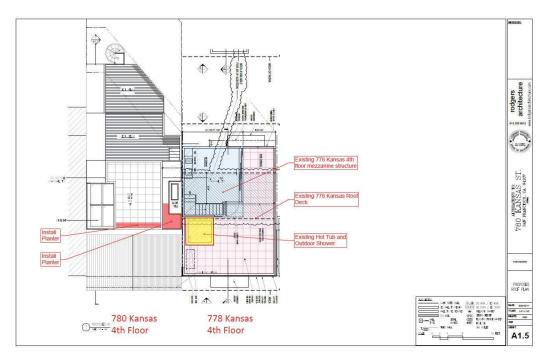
Fourth Set of Proposed Settlement Offer Revisions February 18, 2020 -- Revised Roof Plan and 778 Roof Deck Features shown – Planters installed for privacy
